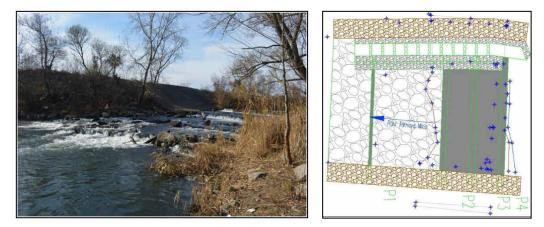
Site view of the triple stepped sector on Târnava Mică River and the designed plan-view for the refurbished hydraulic arrangement with fish passage on the right bank
